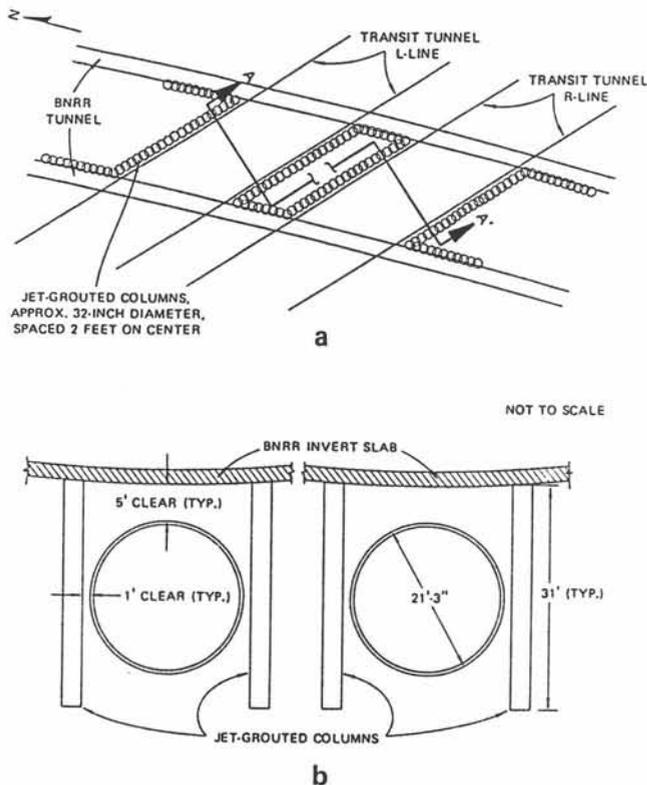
Construction details for Burlington Northern Railroad tunnel undercrossing. a, plan view; b, cross section at A-A'.
